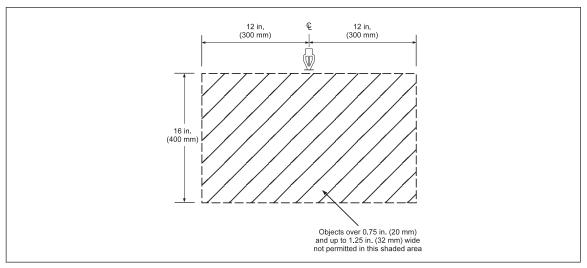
Obstruction area to inner core discharge pattern of pendent Storage sprinklers for objects over 0.75 in. (20 mm) and up to 1.25 in. (32 mm) wide
